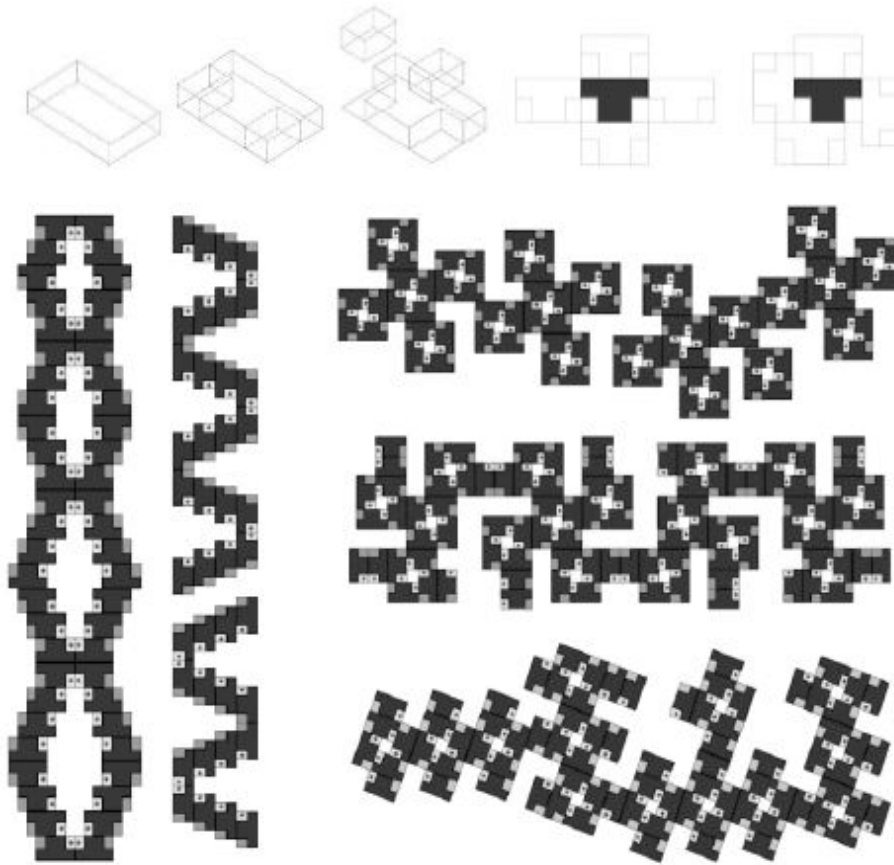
Architectural idea and examples of arrangements. Houses can be connected to each other with any external wall. Examples of house groups (from 50 to 100 units). drawing: Alicja Maciejko.
